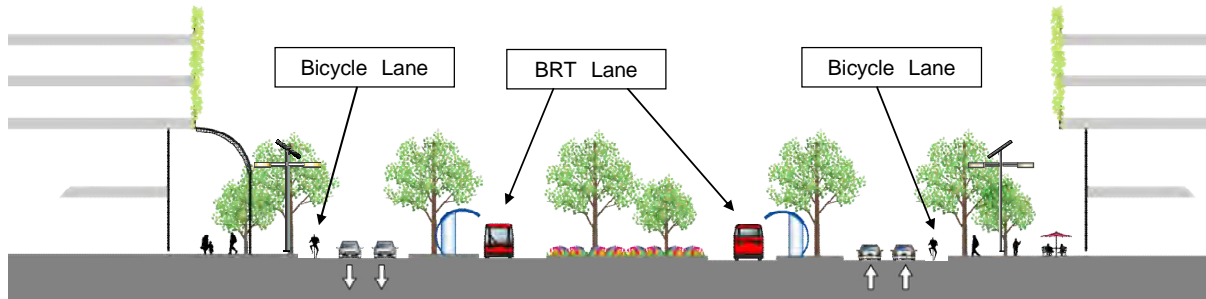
Image of road section at BRT traveling section (within Yujiapu district)
